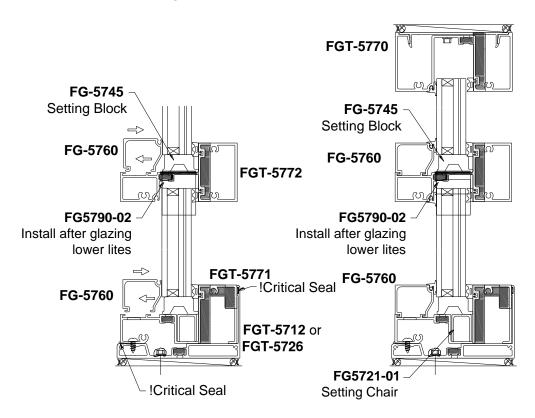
Dry Glaze Glass Stop Installation, Exterior Glaze
